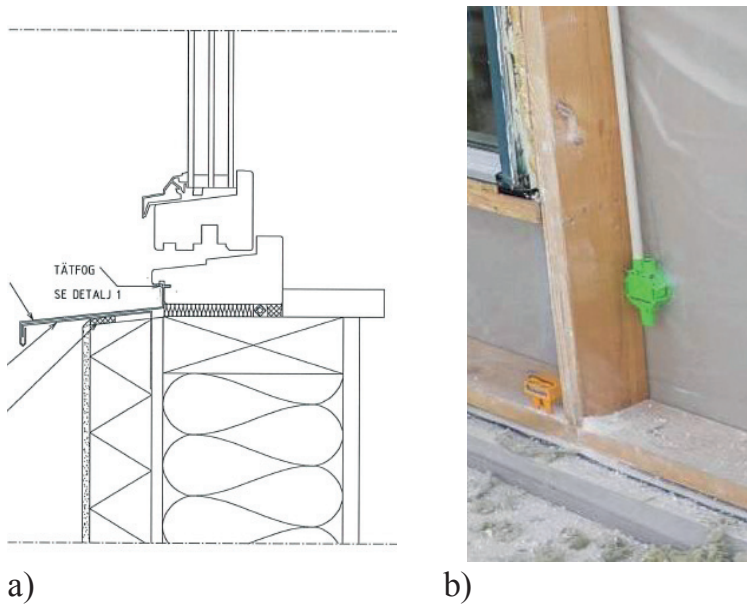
(a) Vertical cross-section of wooden stud wall with new ETICS. (b) Position of measurement point 6 (building B) in the outer part of the sill, façade facing southeast.
